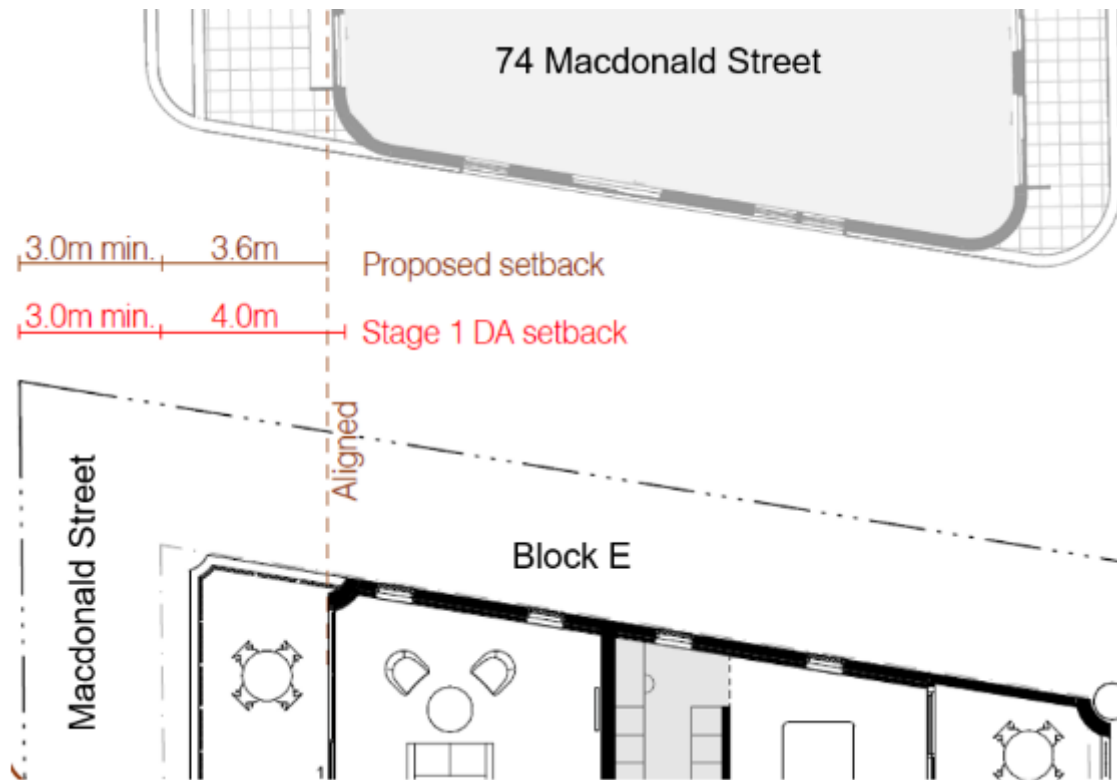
Proposed floor plan - Level 6, depicting aligned upper level setback with 74 Macdonald Street
